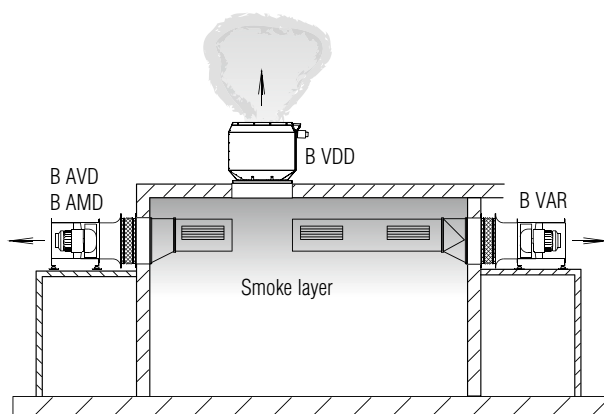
Fans outside of smoke section, inside the building in sufficiently ventilated room
